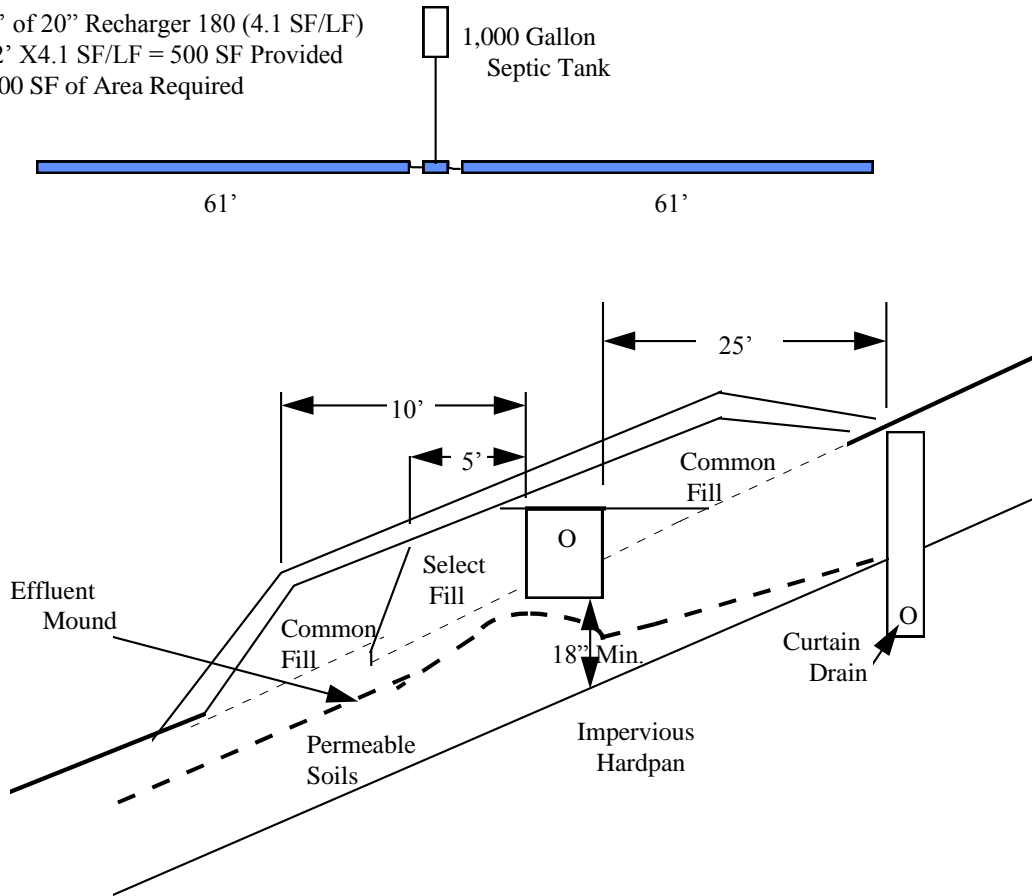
Trenches Spread On Slope Over Impervious Hardpan
